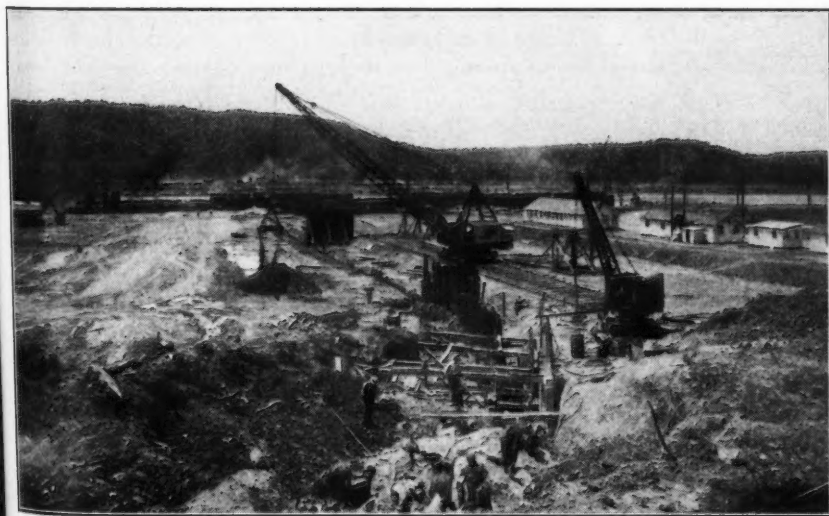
STEEL PILE CUTOFF UNDER NORTH EMBANKMENT, SHOWING TRENCH FOR CUTOFF WALL
